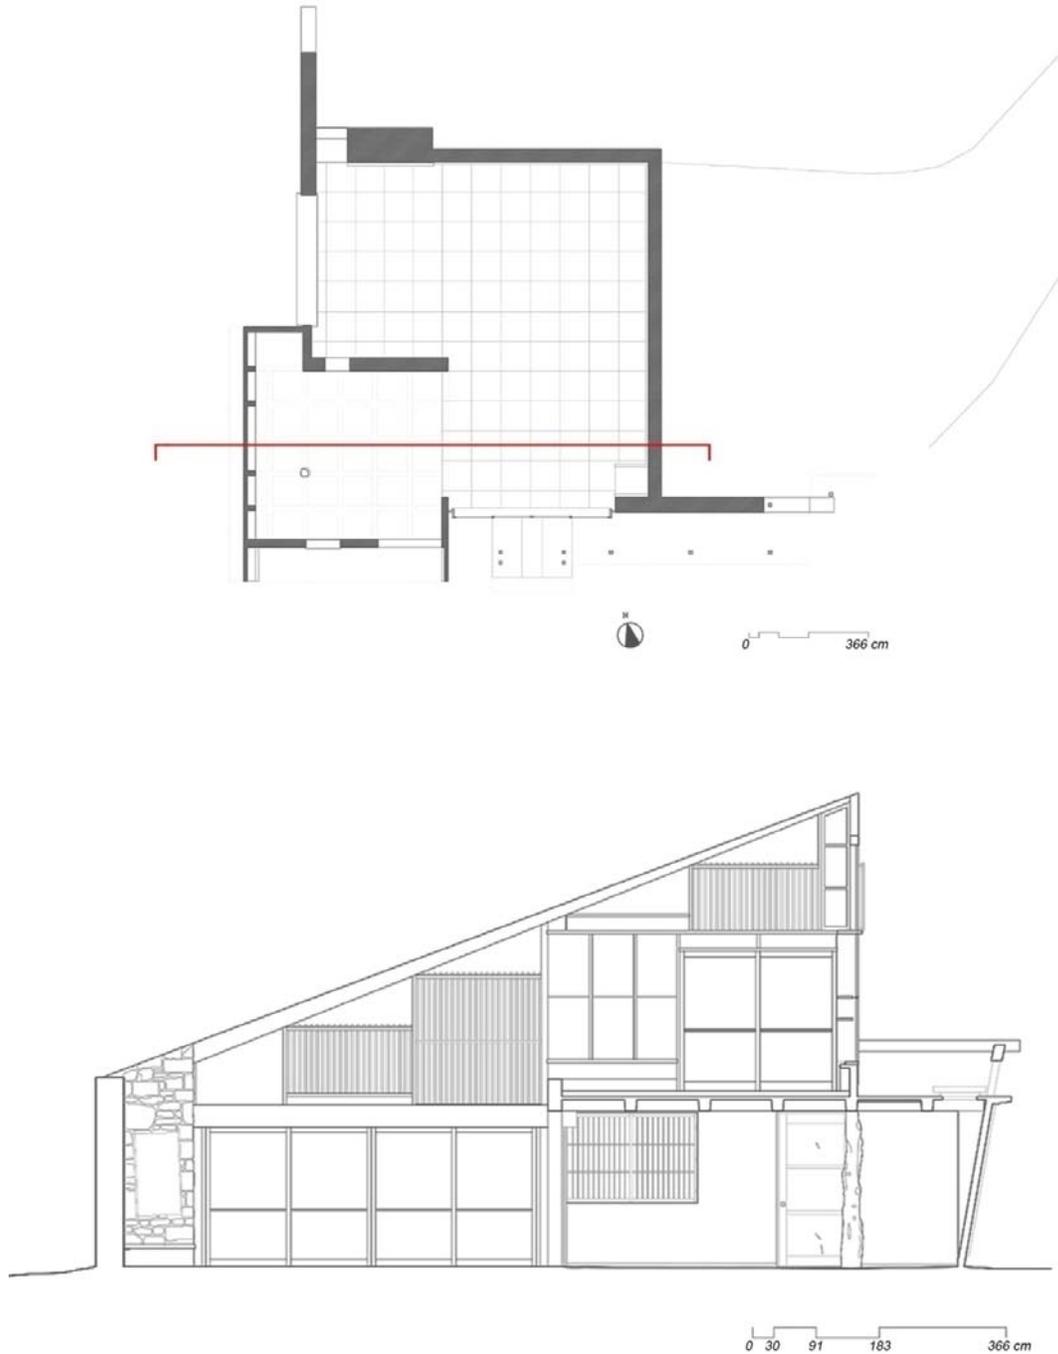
Plan (above) and cross section (below) of Nakashima Arts Building
